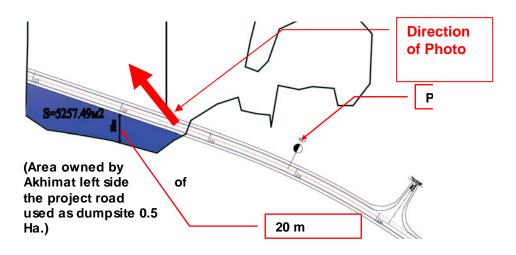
Layout of the Dumpsite with the Photo Project Road (3)
